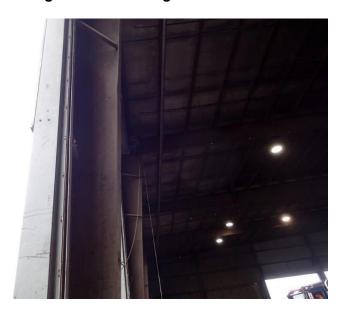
Recently Damaged Column, Abuse Wall, and Bollard at Bay 8 (Repaired)
